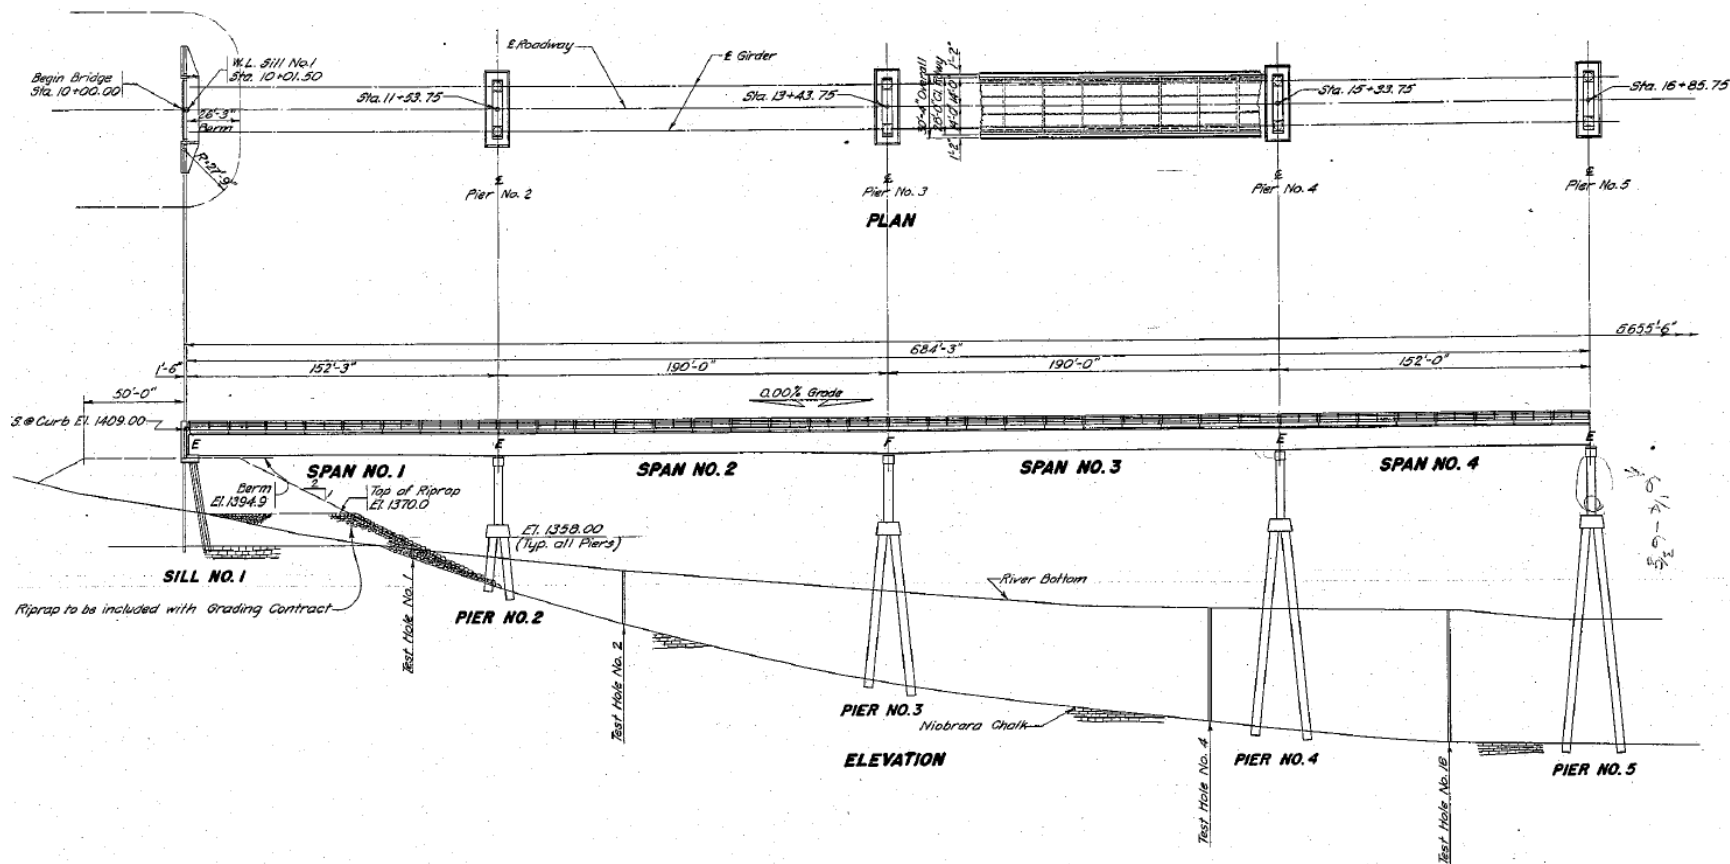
An example of the 684-foot, four-span girder unit, shown in plan and elevation.<sup>5</sup>
